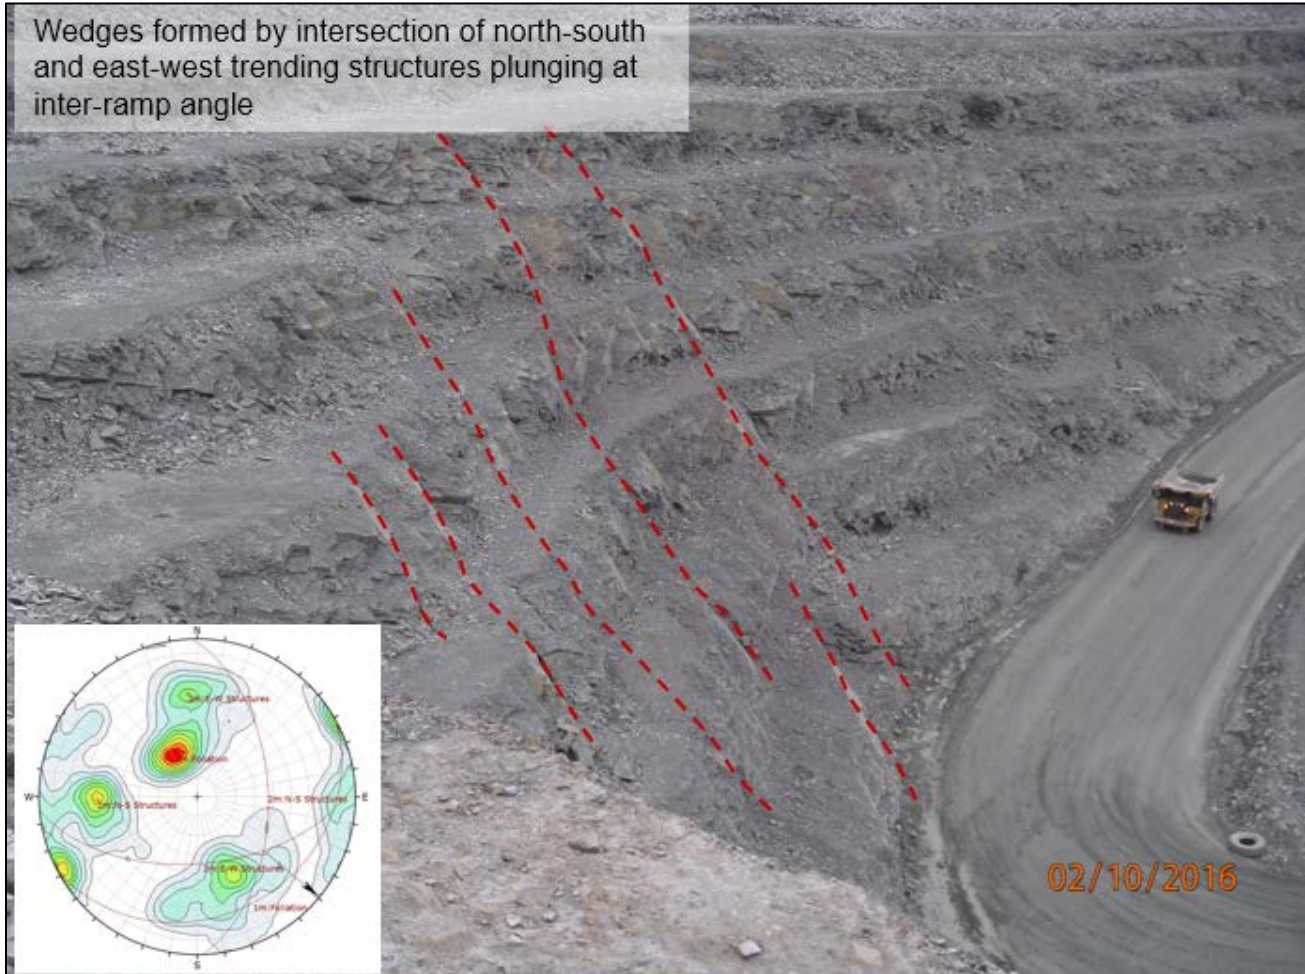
Vault pit grid west footwall slope, south end of pit, looking north
